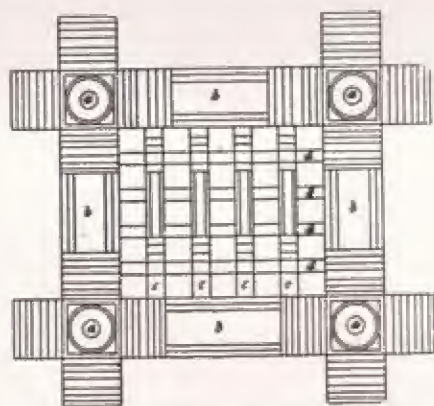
PLAN OF PART OF CEILING, CAVE I.
